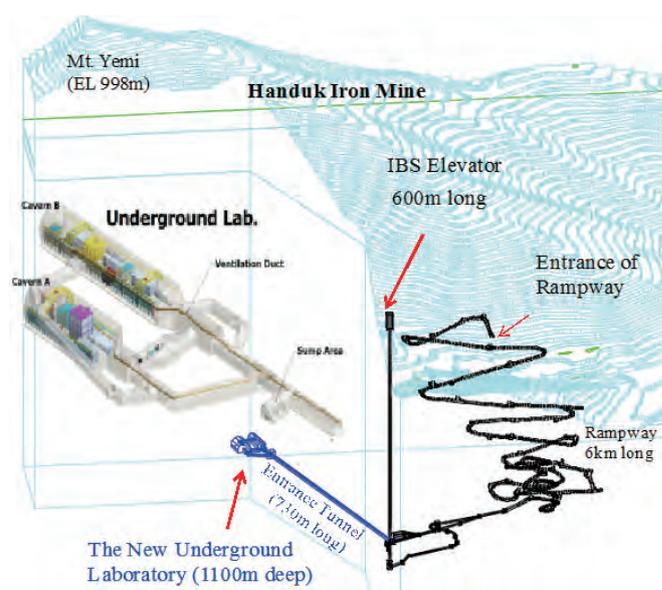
Schematic diagram for the planned underground laboratory in Handuk's active iron mine. IBS will build a dedicated vertical elevator, 730m entrance tunnel, underground laboratory, and ground-level laboratory. Construction will be finished by the end of 2019.
